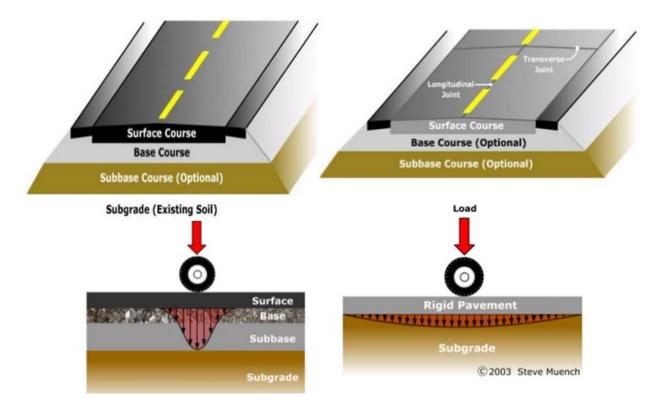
Typical cross-section and stress distribution on flexible and rigid pavement (TxDOT Manual)
